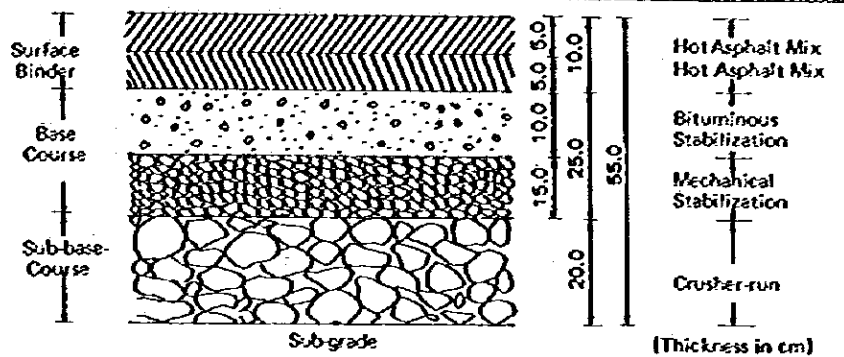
CROSS-SECTION OF PAVEMENT
